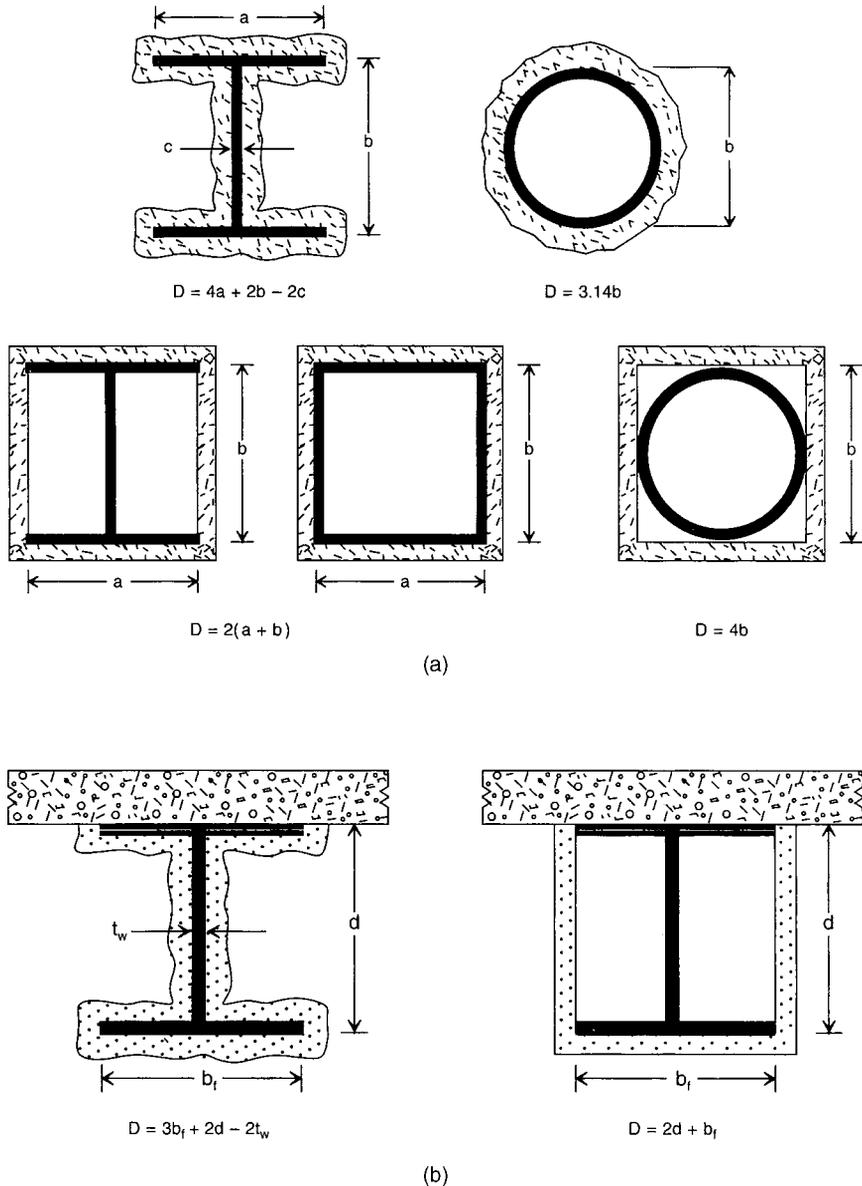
Equations for determining the heated perimeter D of structural steel members (a) columns and (b) beams.
